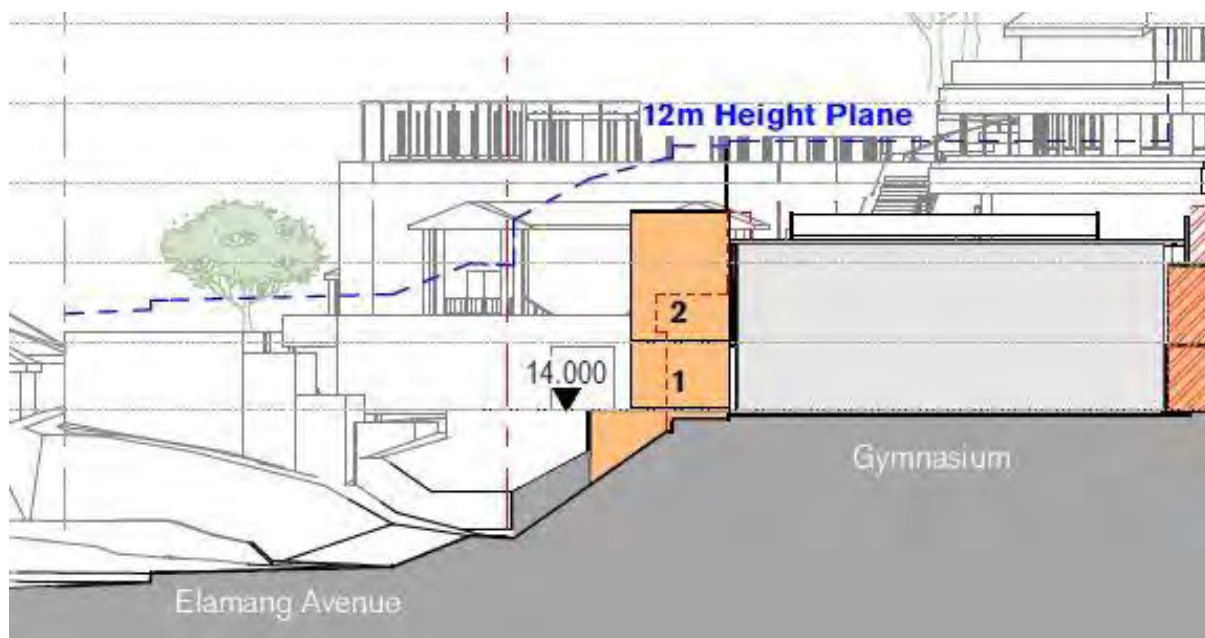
Section through the proposed gymnasium extension envelope—new works are shaded orange, and the existing verandah and roof parapet are outlined in red dotted lines. (Source: Excerpt from fjmt drawing MP-4003)
